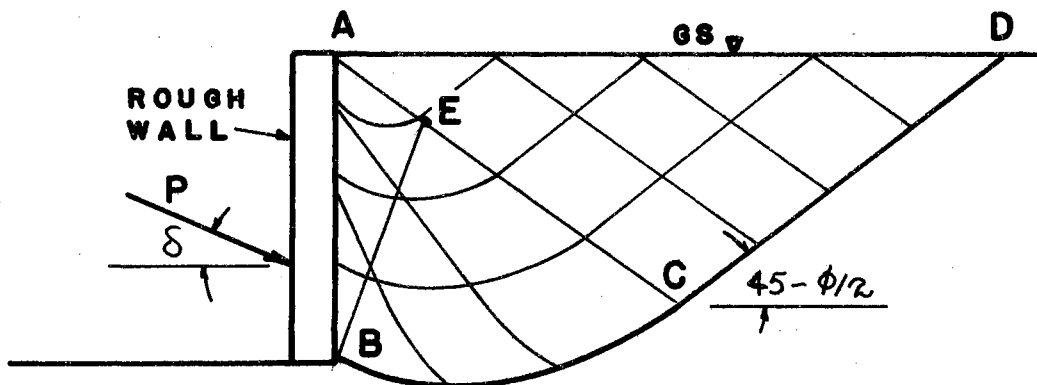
Soil Failure Line Resulting from Pushing a Rough Faced Retaining Wall Against a Cohesive Soil
